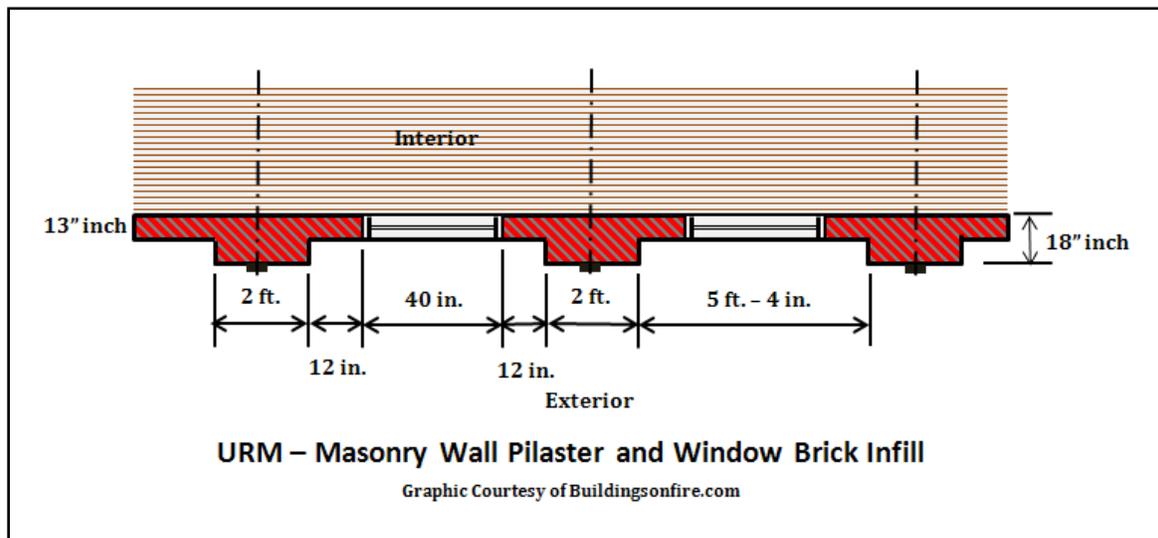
URM-Masonry Wall Pilaster and Infill Plan
